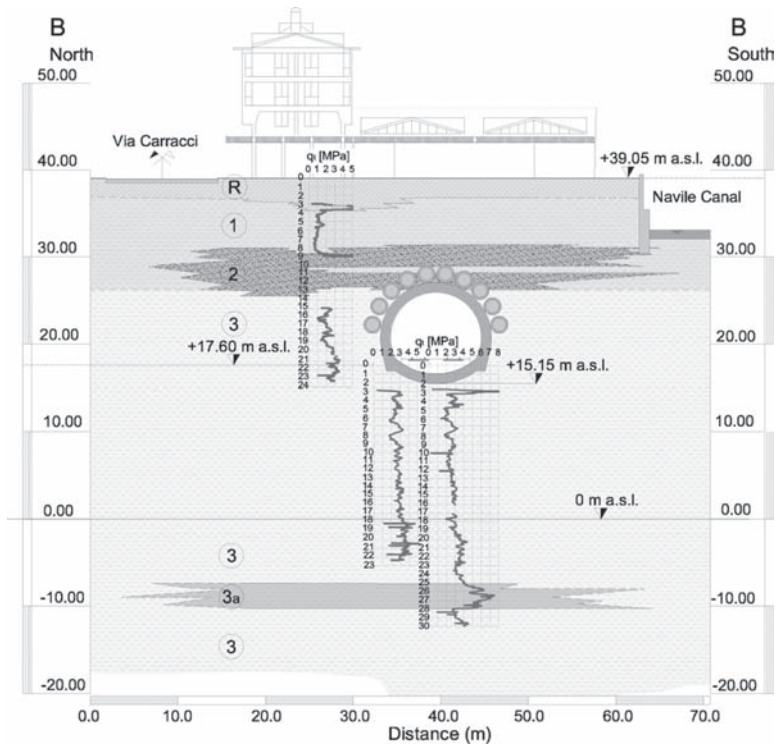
Schematic stratigraphic section of the subsoil and typical tunnel cross section (section B-B in Figure 1).
